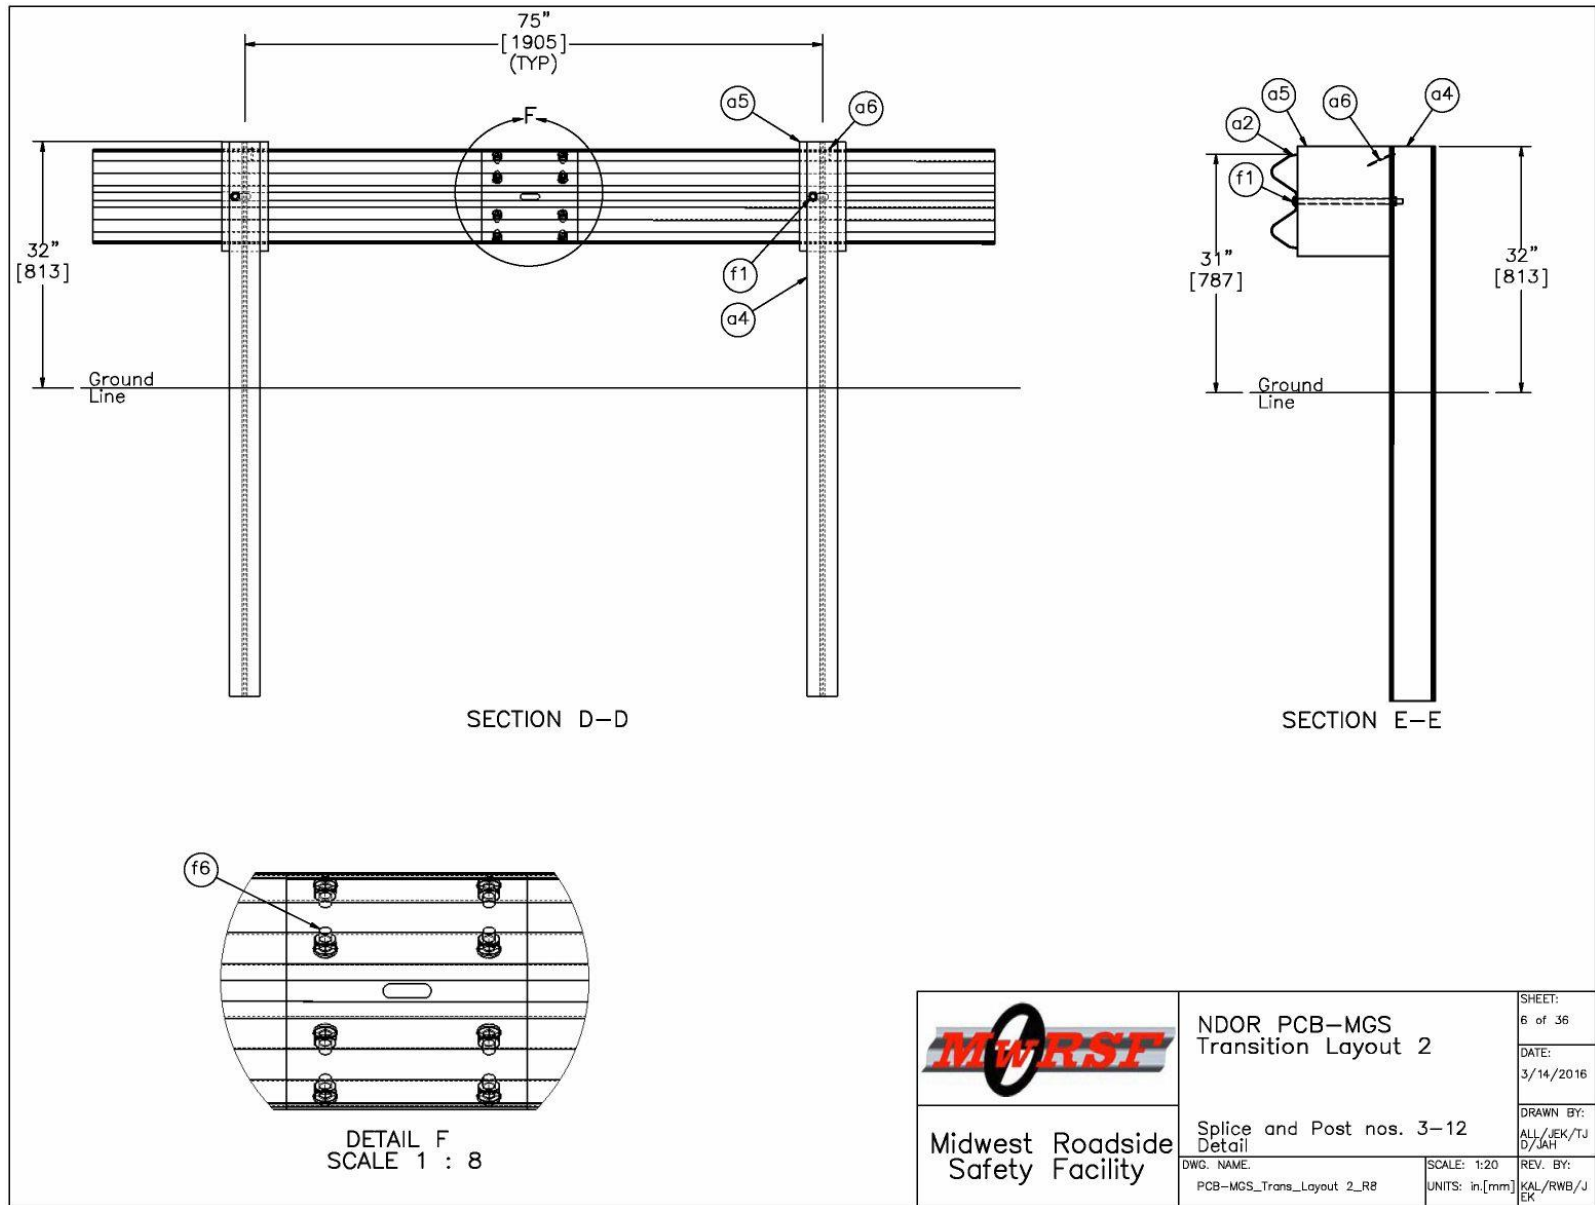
Splice and Post Nos. 3-12 Detail, Test No. MGSPCB-1
